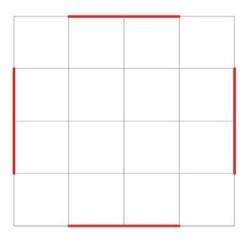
(a) Structural Plan for V-braced RC Frame (Model-6)
